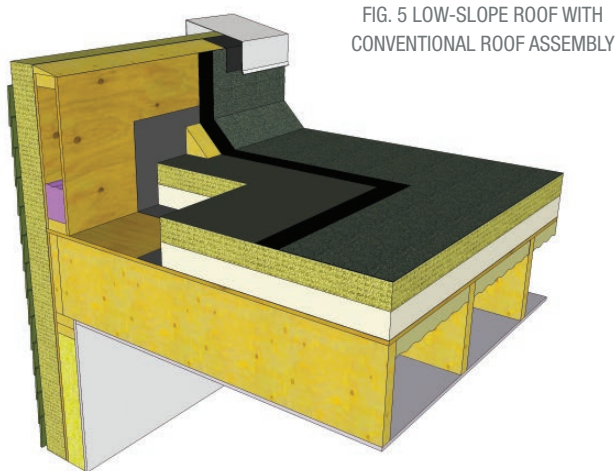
LOW-SLOPE ROOF WITH CONVENTIONAL ROOF ASSEMBLY
